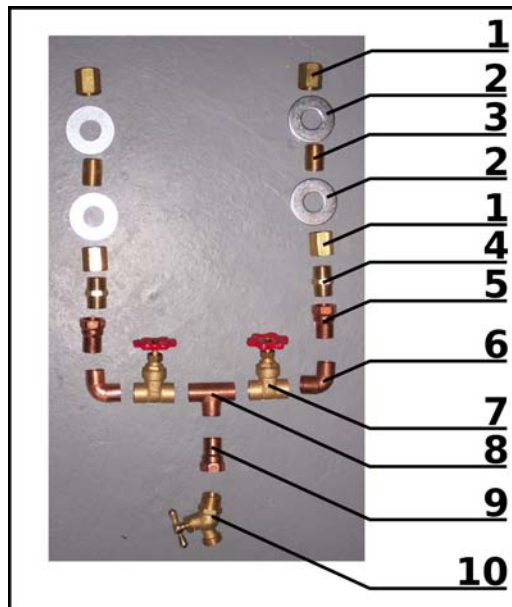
Original plumbing plan showing only fixtures, not the copper pipe.
